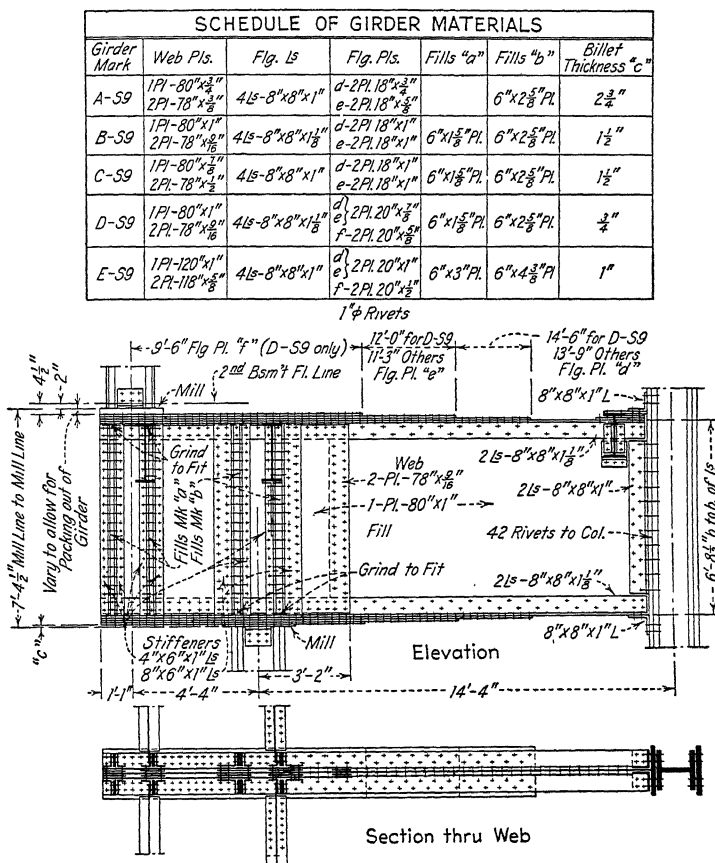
(a).—Detail of Girders A-S9, B-S9, C-S9, and D-S9. Girder D-S9 Shown.
